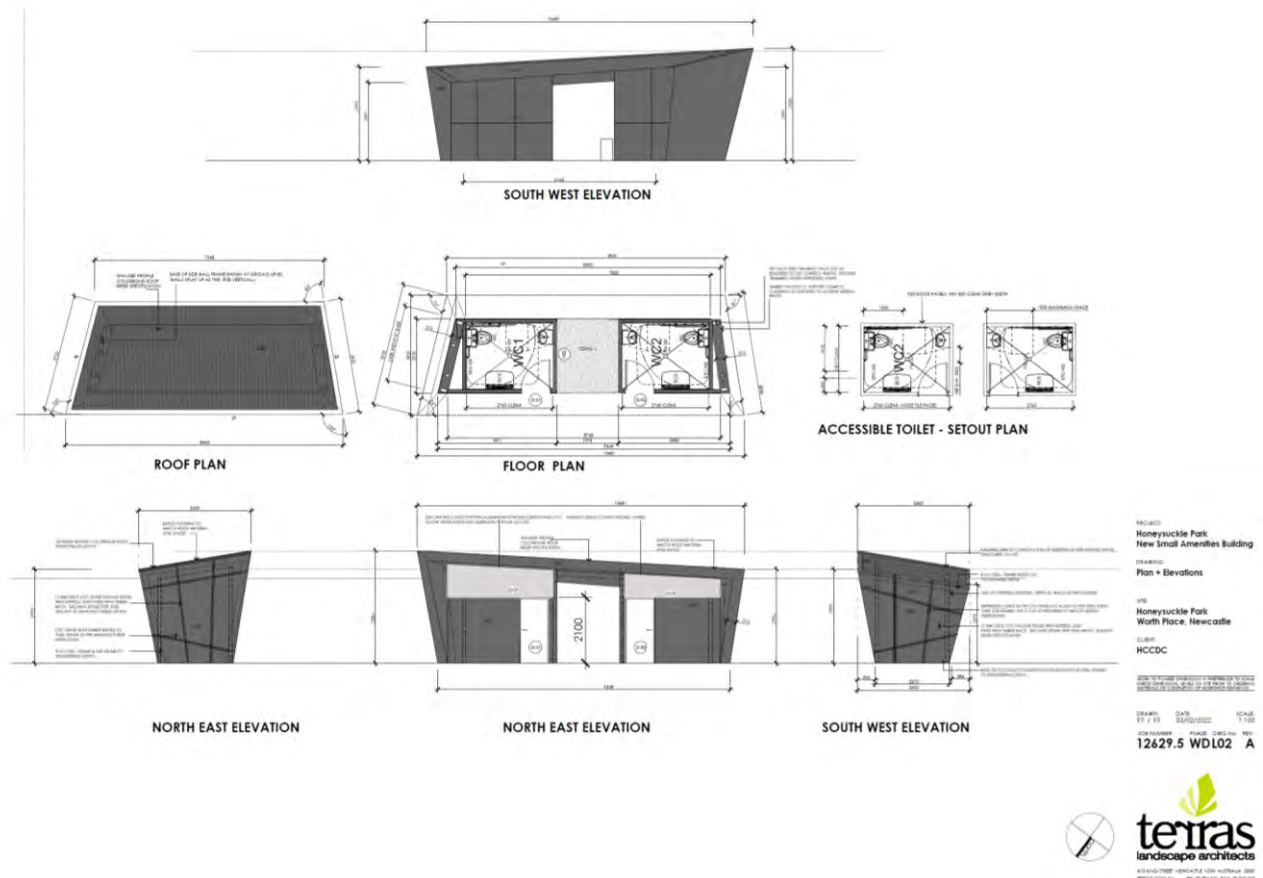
Shows the plan and elevations of the new accessible toilet facility
